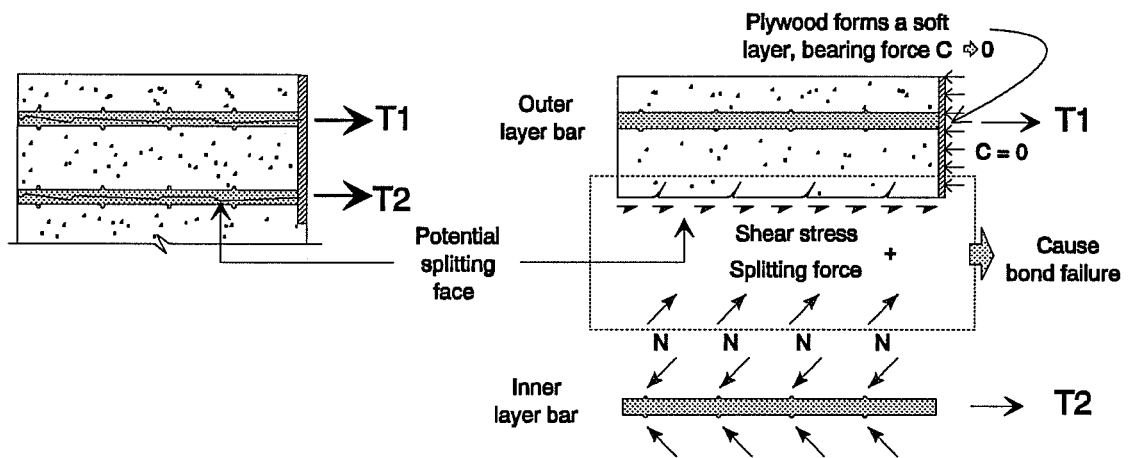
Bond failure mechanism of test region (Specimen #1), Plywood was used as separating material
